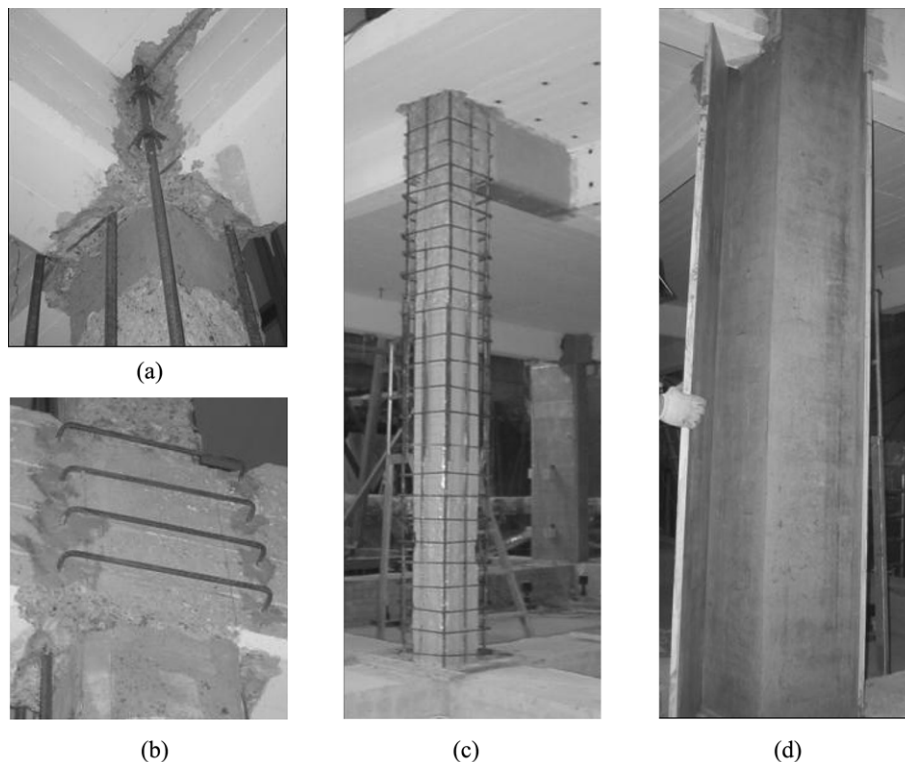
RC jacketing: added longitudinal reinforcement (a), added stirrups on joints (b); added reinforcement (c); and column after the jacketing (d)
